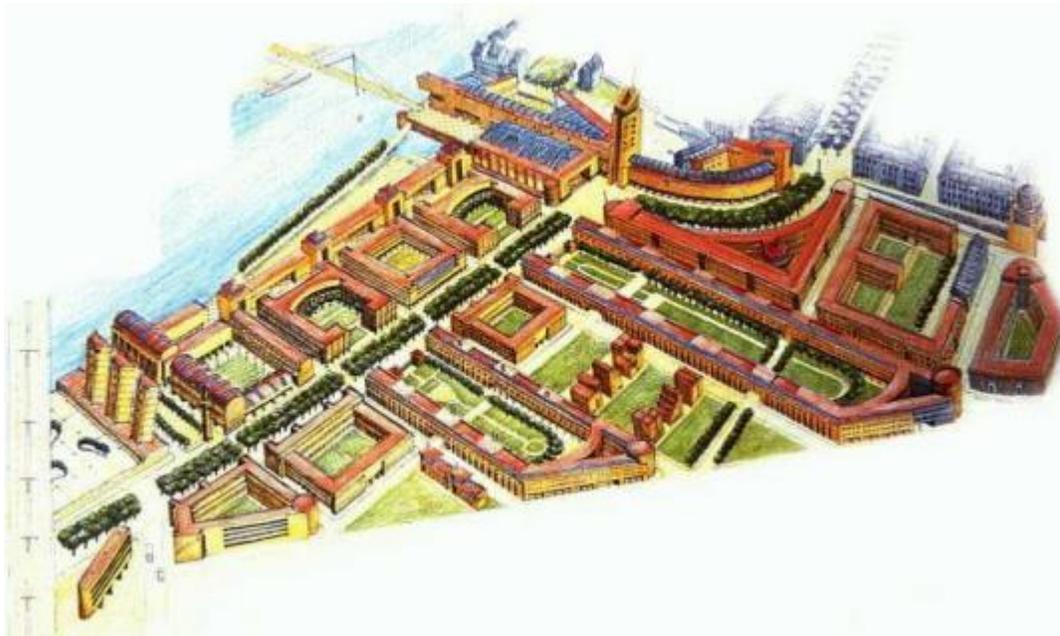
Master plan Sfink-C ramique area (source: [blogspot](#))
